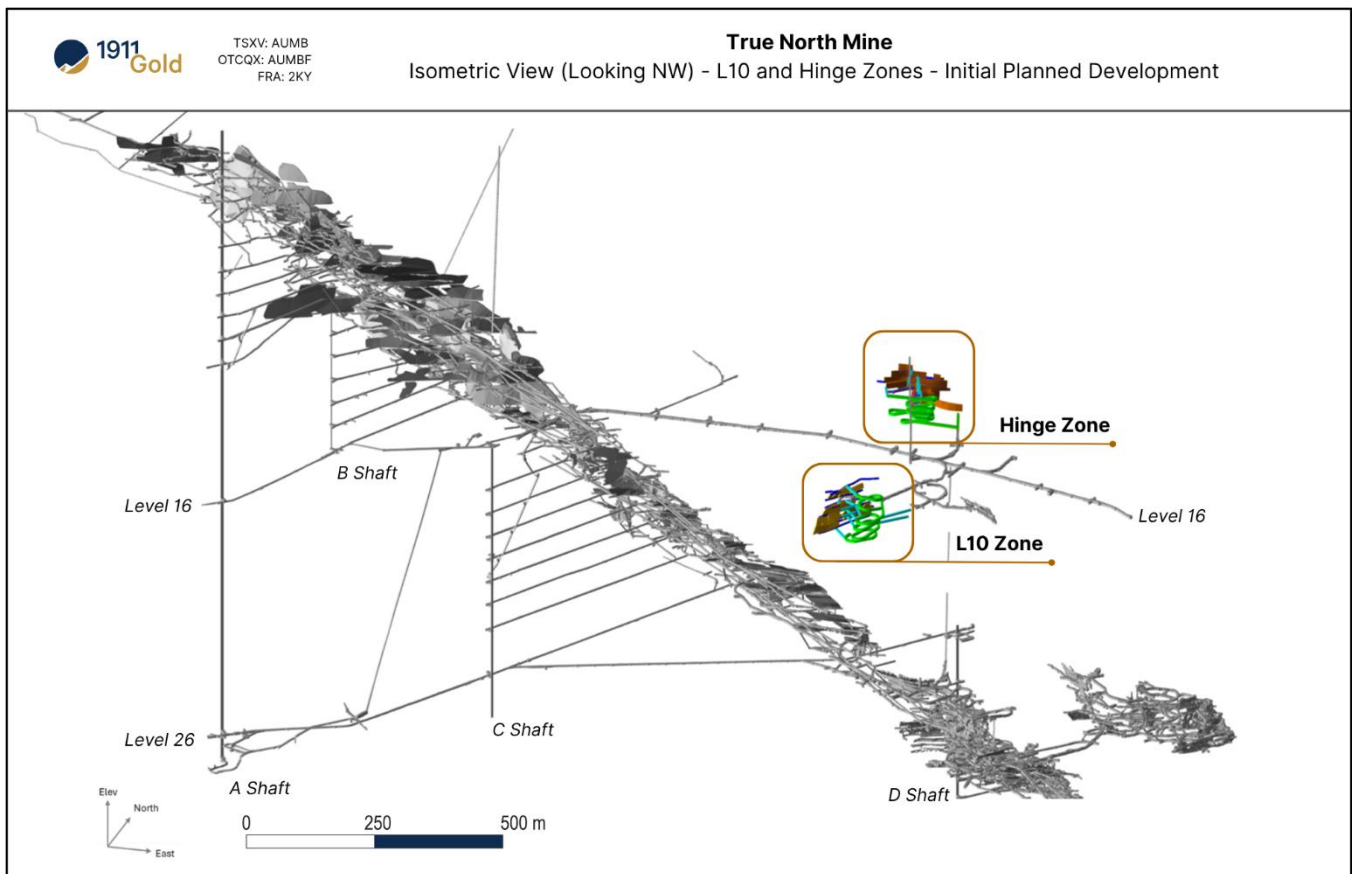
Section View – True North Mine L10 and Hinge Zones – Initial Planned Development
